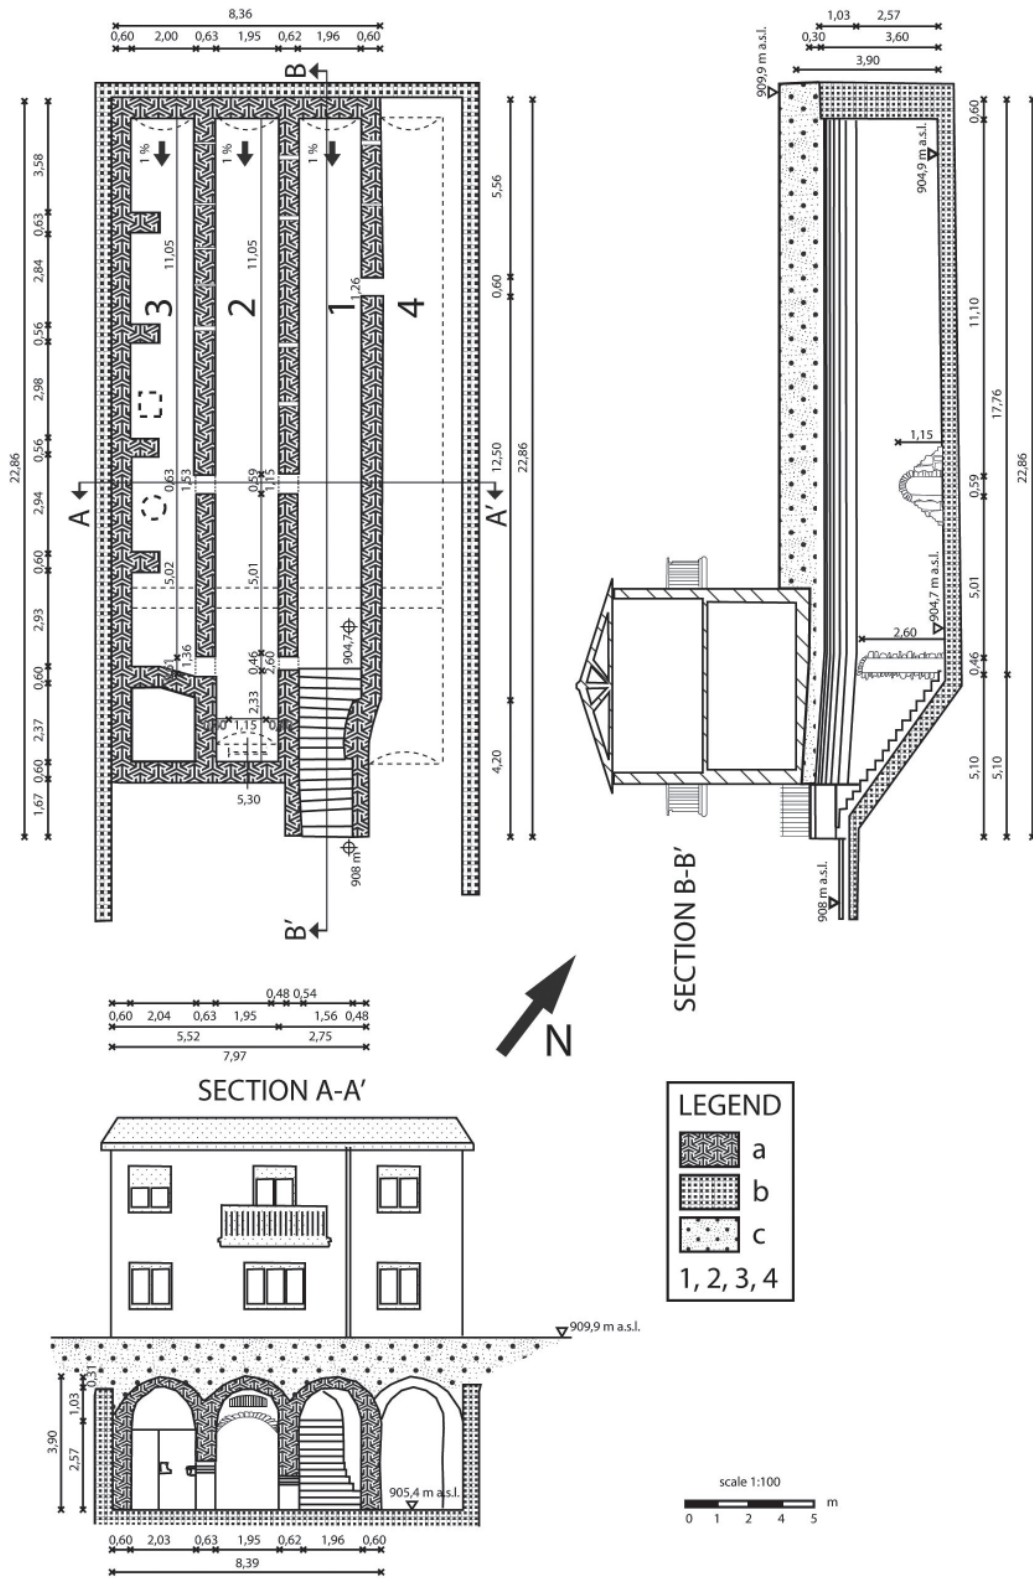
Planimetry and sections of the tunnels. a, wallings consisting of opus caementitium; b, substratum; c, soil; 1, 2, 3, visible tunnels; 4, tunnel filled in
